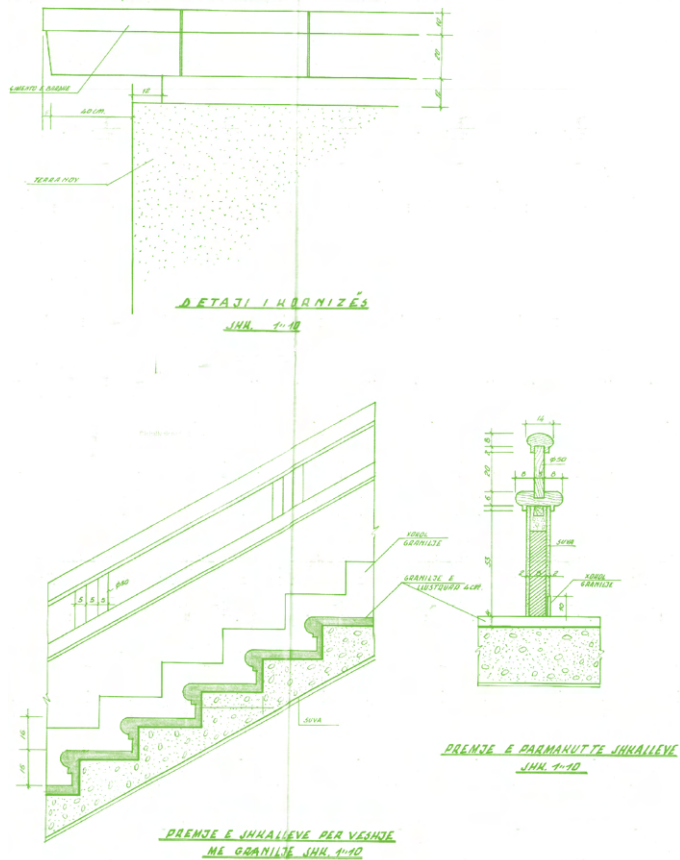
Details of the staircase, handrails, and the building's main decorative frame, AQTN.
